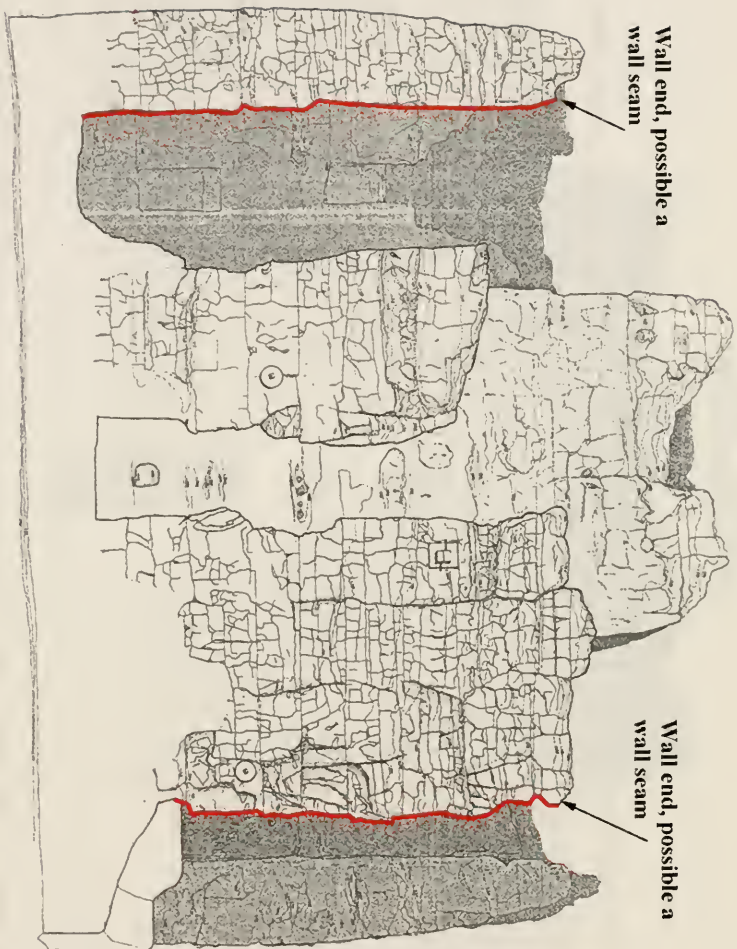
South elevation with evidence of tier construction (Myra, P and E. Borchers, Terrestrial photogrammetry of the Great House, 1979. Courtesy Casa Grande Ruins National Monument)
